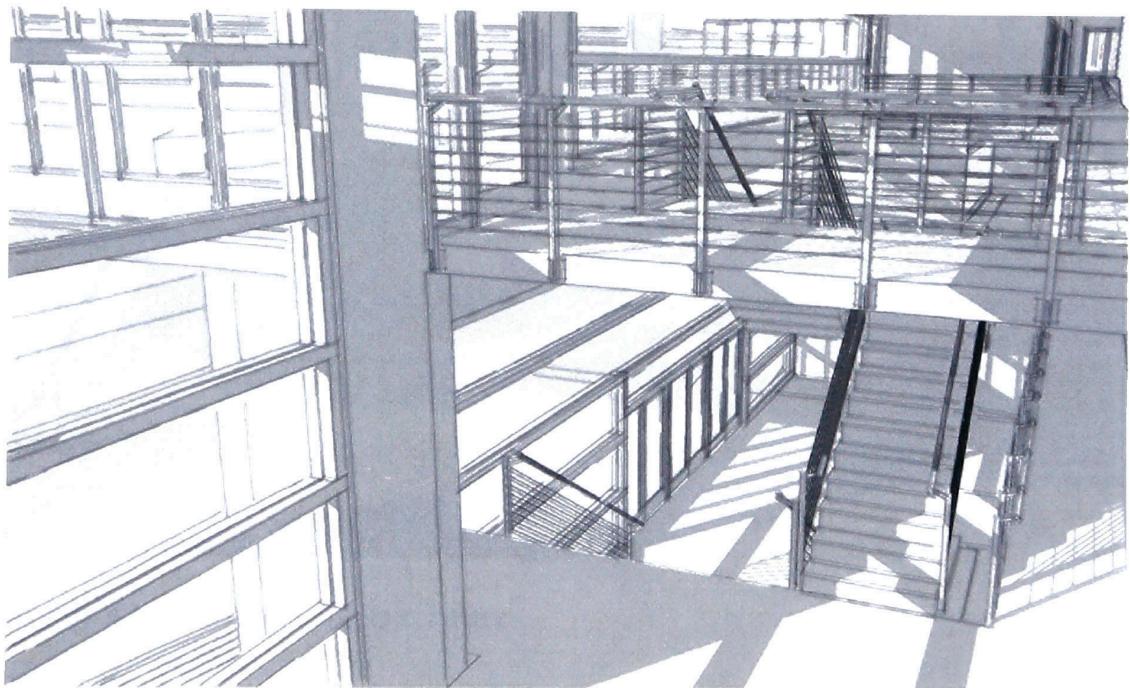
Interior of Station Looking at Walkway Leading from Top Parking Terrace to Stair Tower
